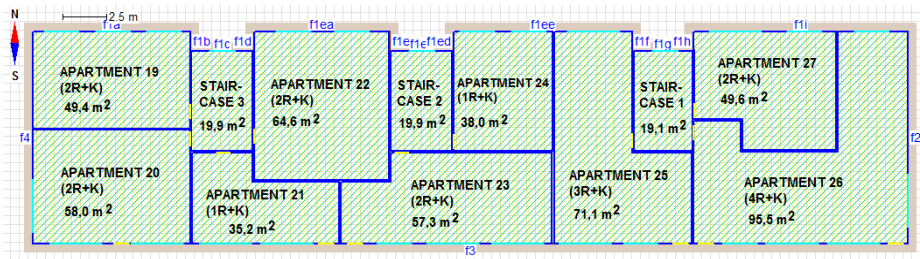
The floor layout of the apartment floors (r = room, k = kitchen).
